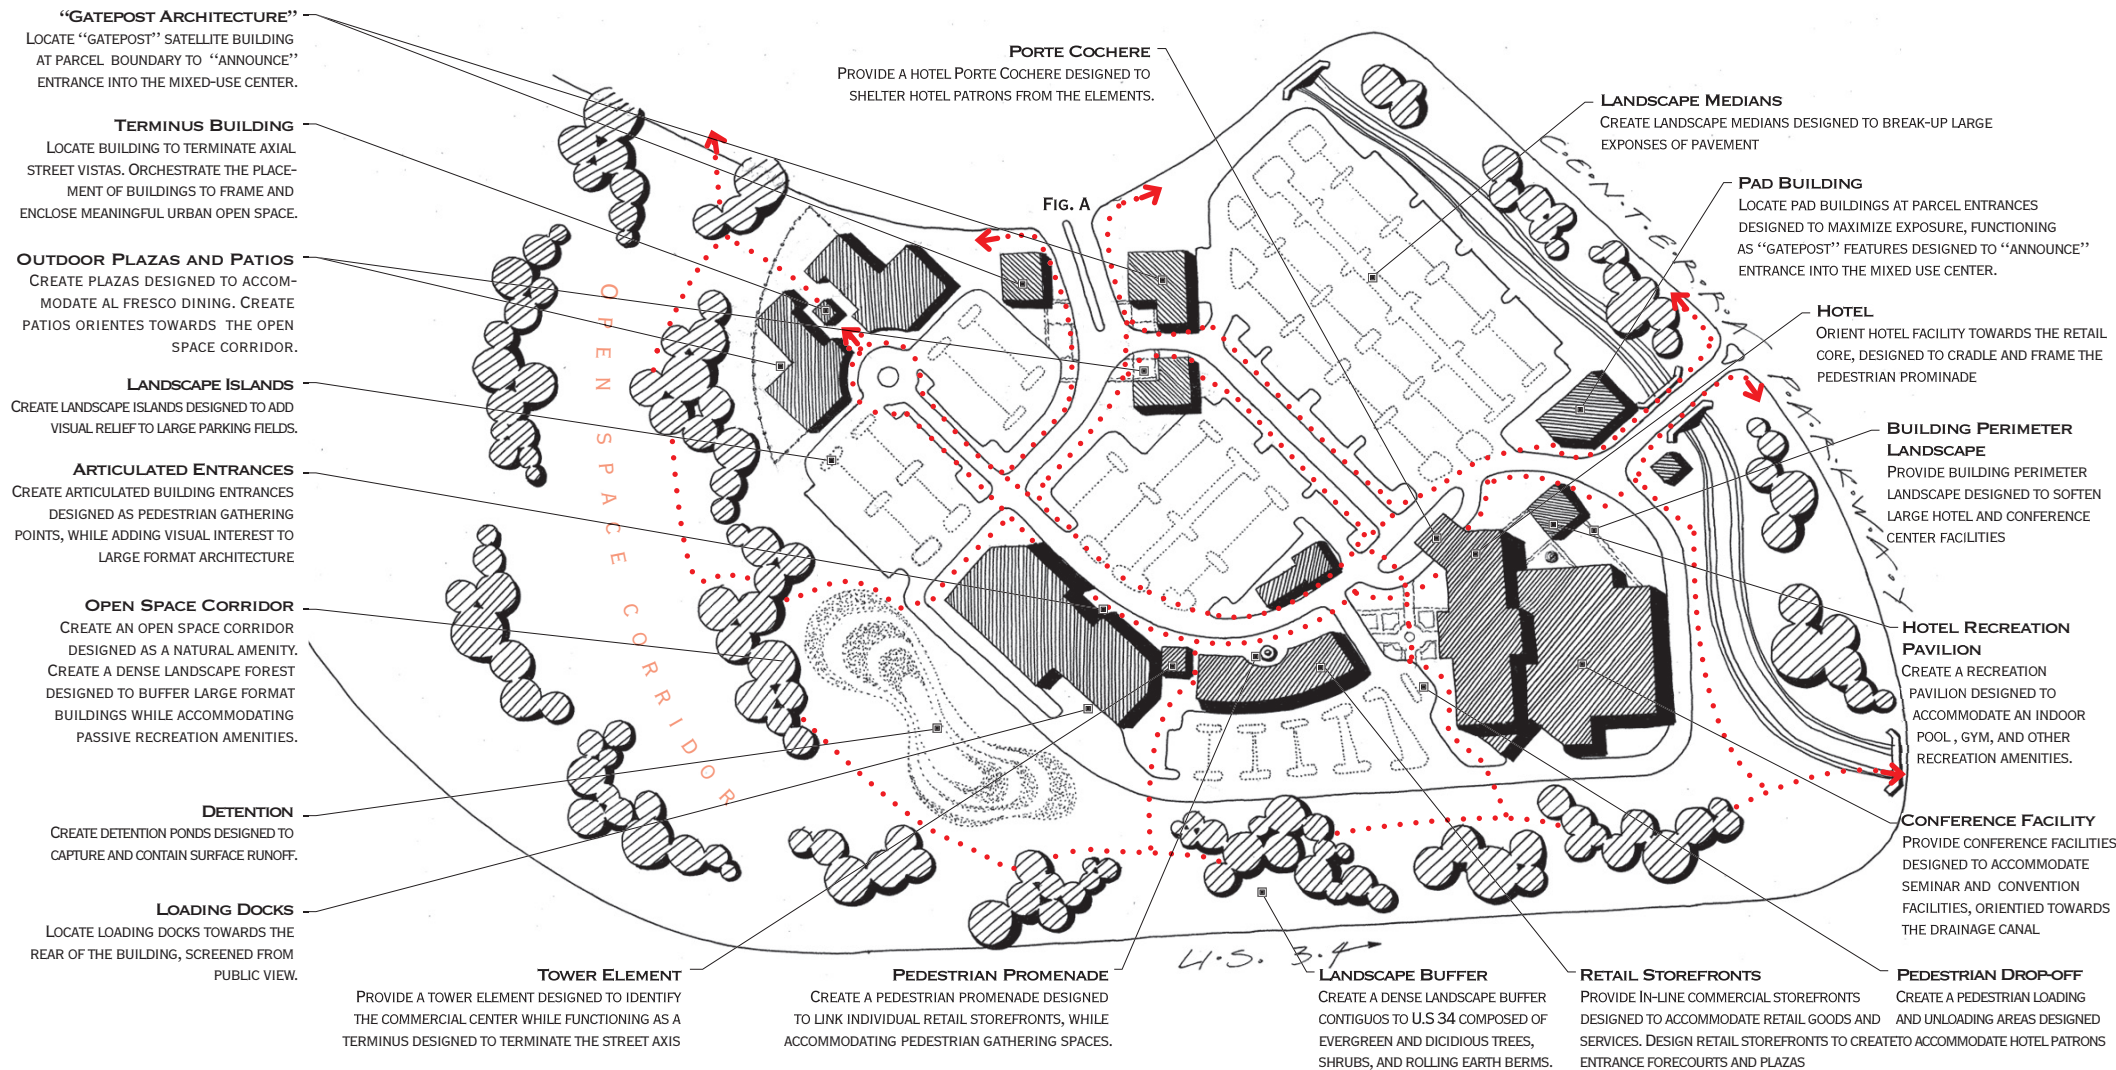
USE BUILDINGS TO FRAME AND ENCLOSE MEANINGFUL, FORMAL OPEN SPACE. NOTICE HOW THESE IN-LINE RETAIL BUILDINGS CREATE A PEDESTRIAN FORECOURT.
